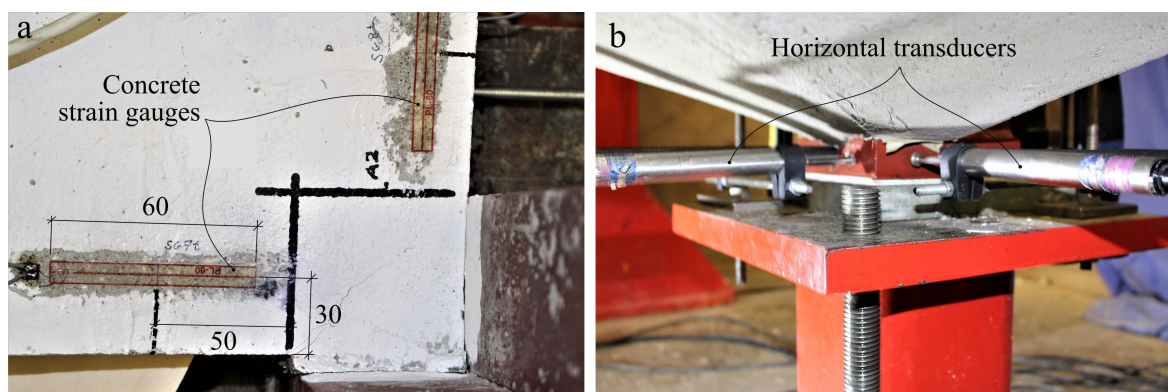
Instrumentation details including a) concrete strain gauges near a corner support and b) transducers monitoring horizontal displacement of corner supports.
